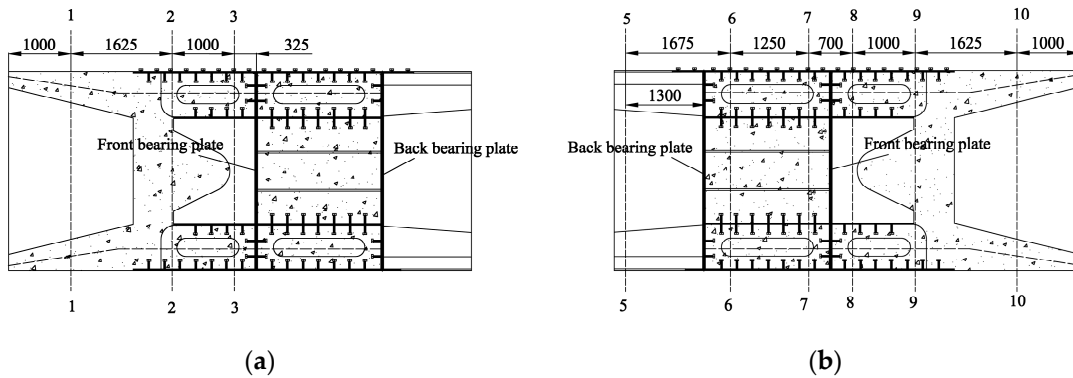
Stress monitoring section in the joint. (a) sections 1-1-3-3 arrangement (mm). (b) sections 5-5-10-10 arrangement (mm).
